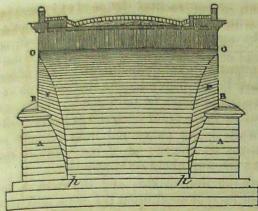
Represents a cross section and elevation through the crown of Fig. 113, show-ing the arrangement also of the roadway, foot-paths, parapet, and cornice.
